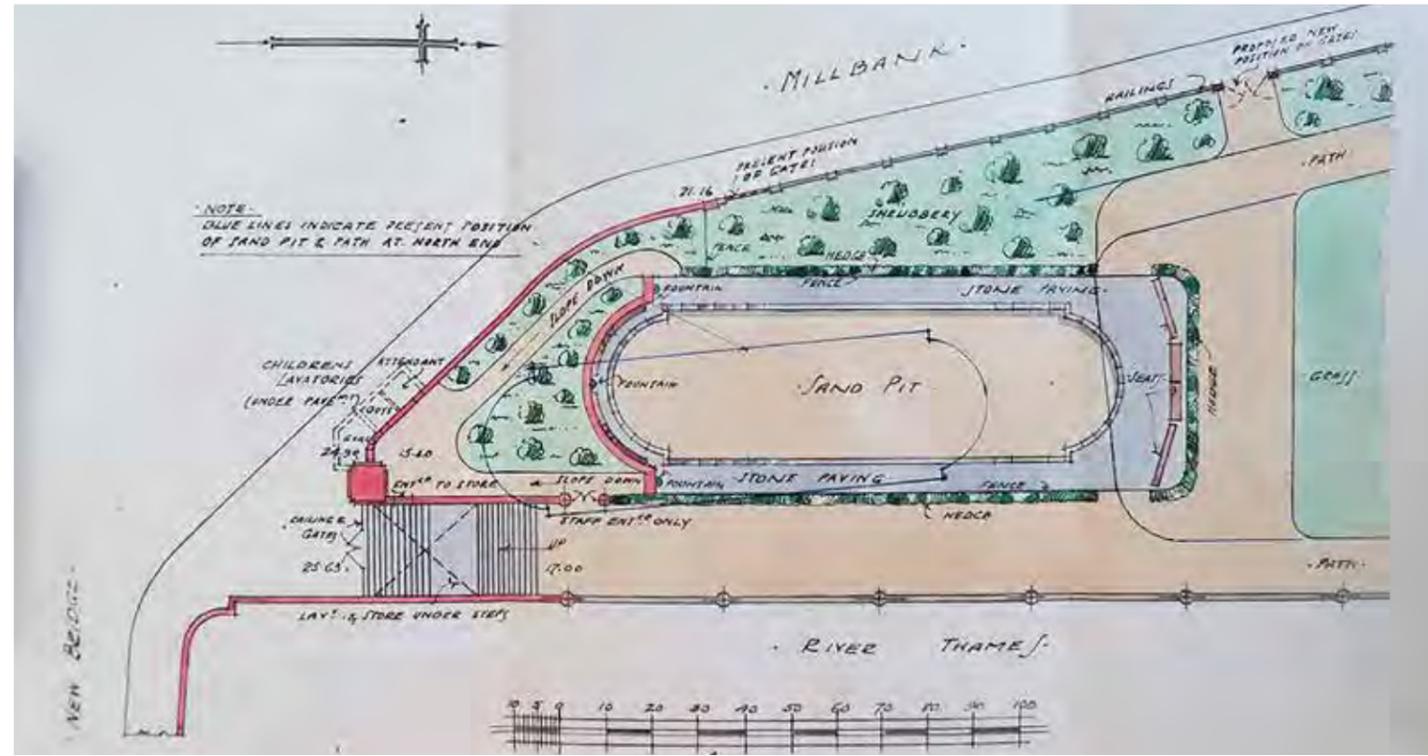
Plan of 1927 showing alterations to the sandpit to accommodate the new Lambeth Bridge
